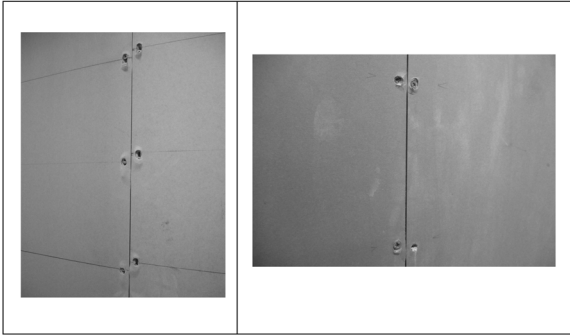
Failure of nailed joints of one side OSB shear wall (OSB).
